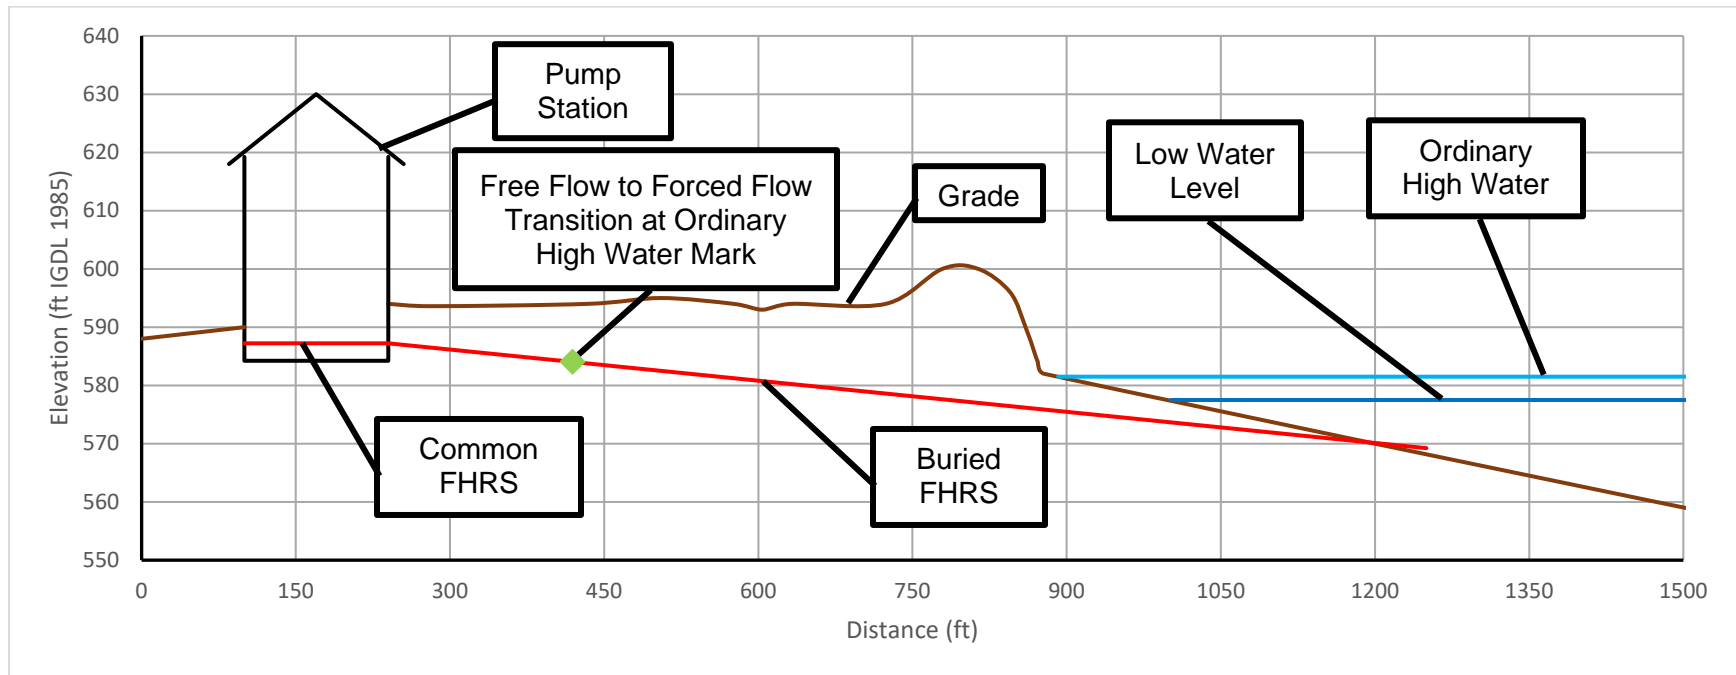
Pump Station #2 Fish Handling and Return System Cross Elevation
